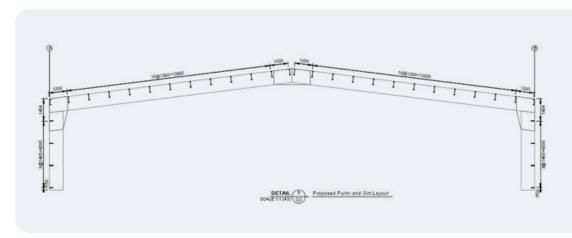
Section of Timber Portal Frame (10.0 m portal spacing shown).
